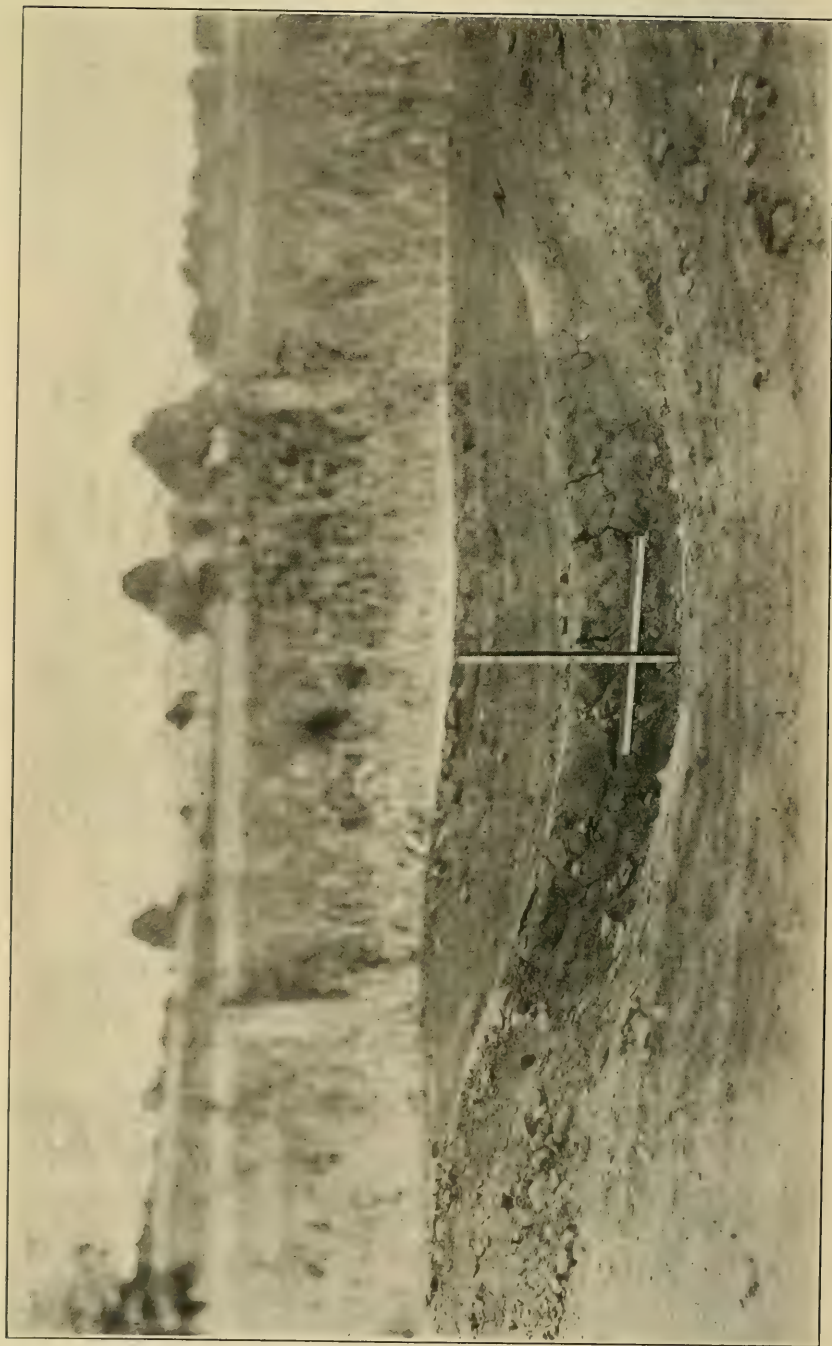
U HEAD WALL WITH PIPE CULVERT.
